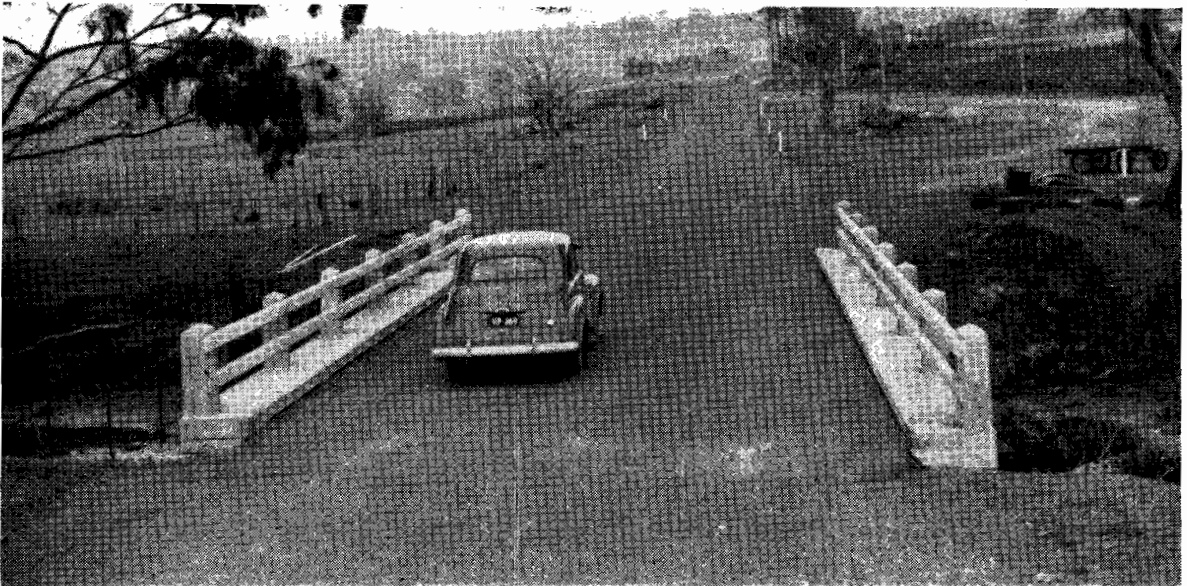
Slab-type bridge over Deep Creek on Casterton-Apsley Road near Dunrobin, precast by the Glenelg Shire.
